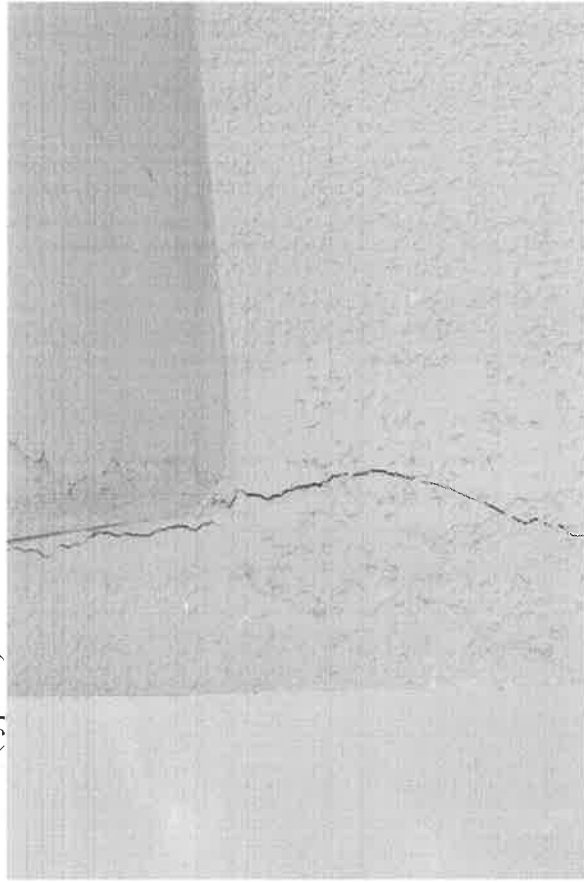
Hairline crack in previously repaired CMU wall at unit 1103 (typical)
